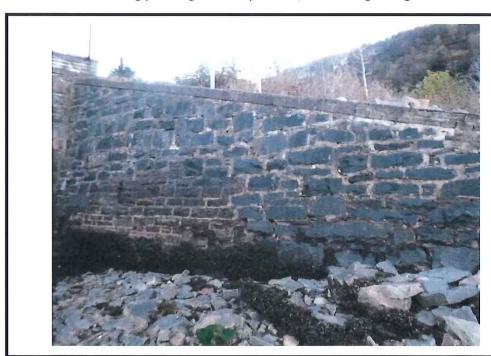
Showing downstream, high mileage wing wall and vegetation growth in the tidal zone
